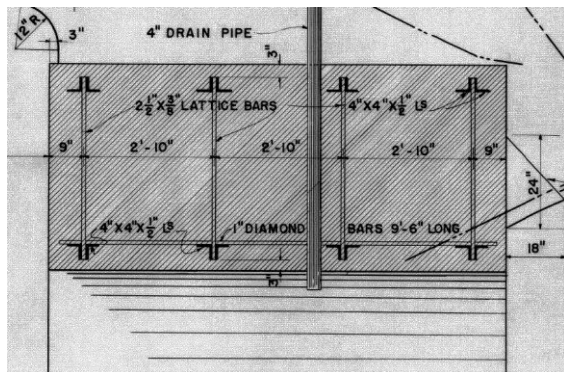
Typical cross section through outer arch rib (from 1918 plans).
